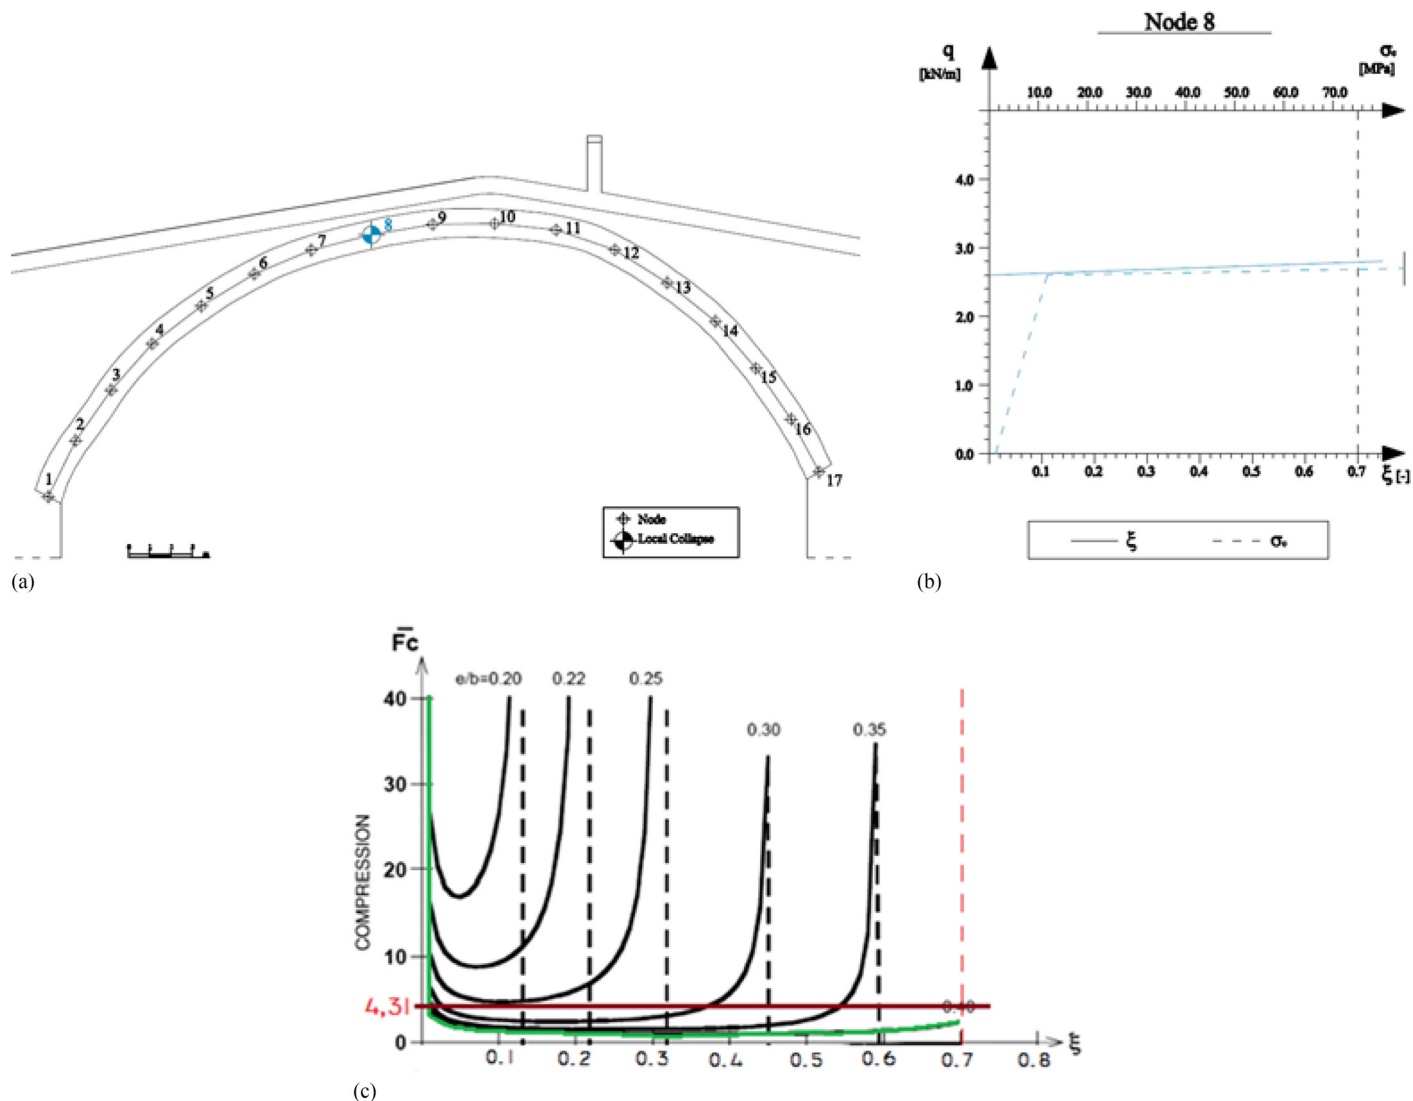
Devil's Bridge: (a) damage localization; (b) local collapse; (c) snap-through
